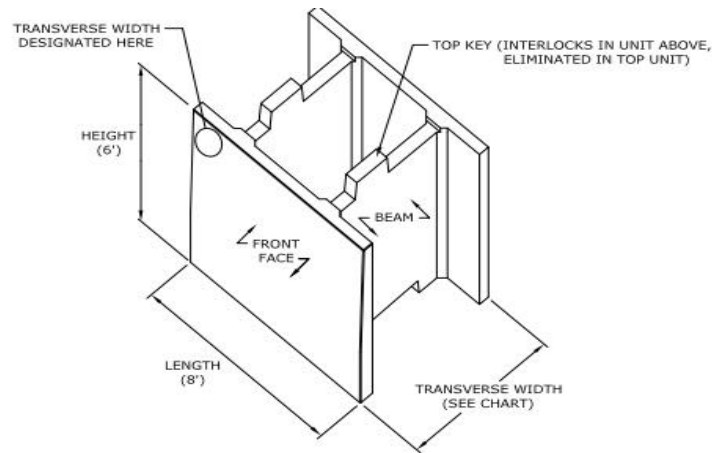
Typical Twal module. (Doublewal, 2014)⁸
